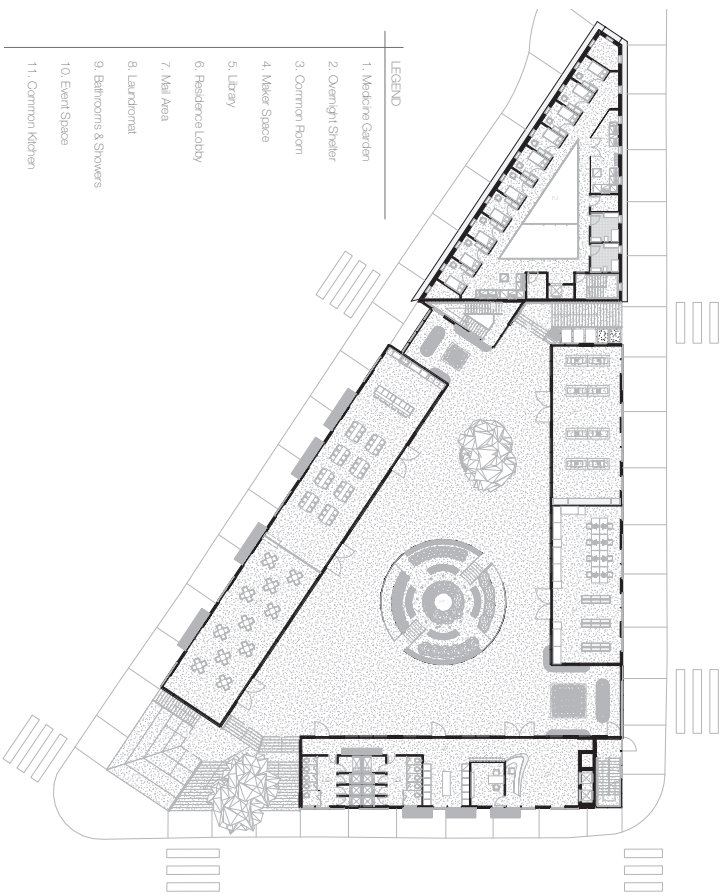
Home podium / Level level 2 floor plan 1:500.
